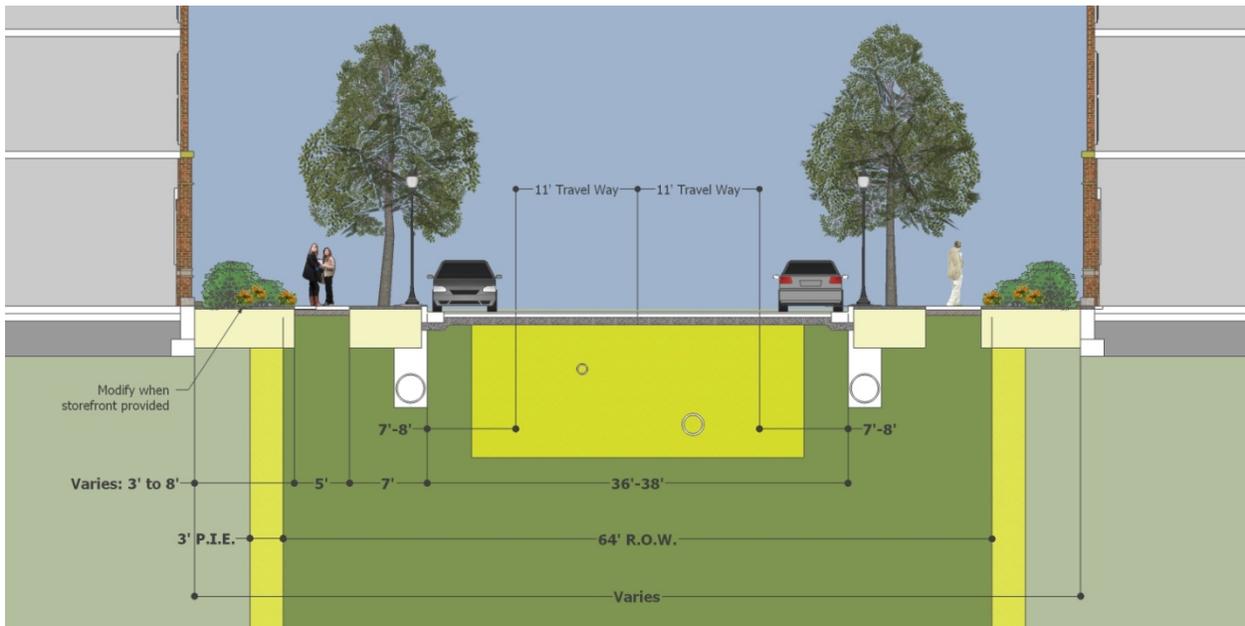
Typical Commercial Street (ST-64-38) with two travel lanes only. Right-of-way may be reduced to 40 feet when streetside areas are put into private ownership. PUEs are planned in alleys. Where necessary, PUEs will be provided along street right-of-way edges in order to provide connectivity in the system, based on a comprehensive PUE design established at Schematic Development Plan. See Figure 7 for typical street-edge PUE location.
